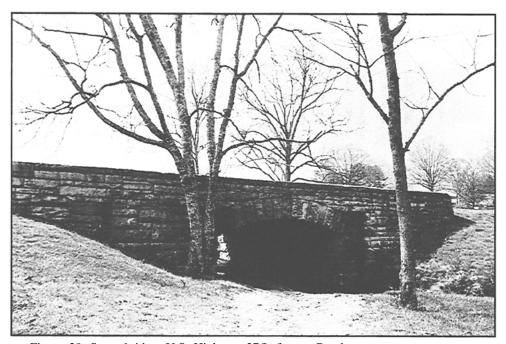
Stone bridge, U.S. Highway 27/Lafayette Road
